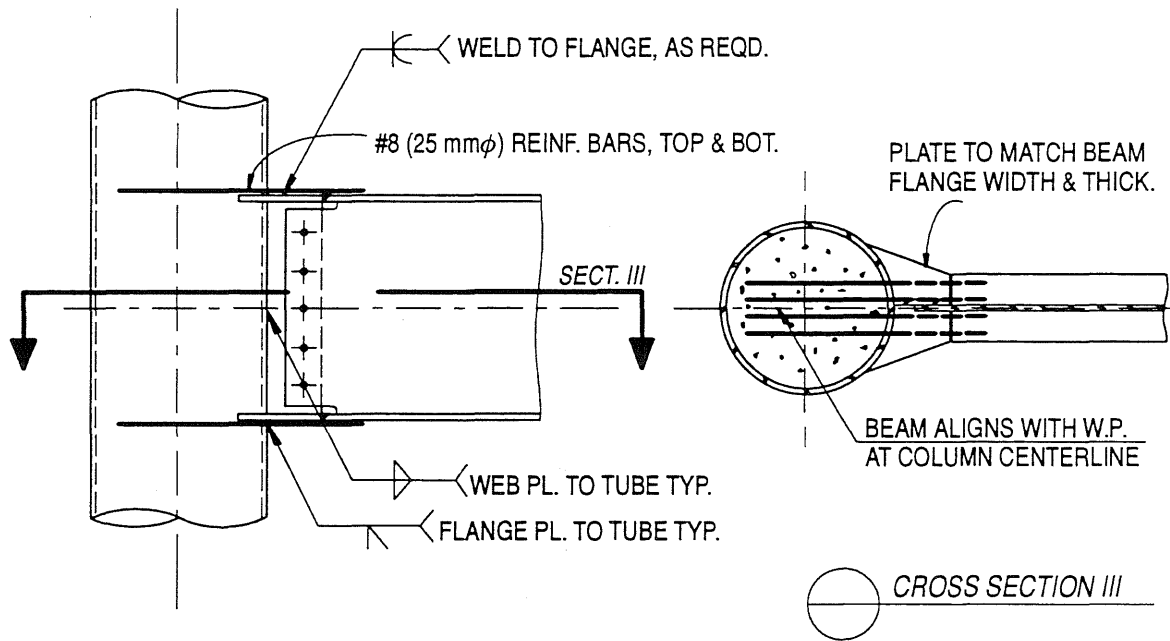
Joint with Deformed Bars Embedded in Concrete Core, *Type III
